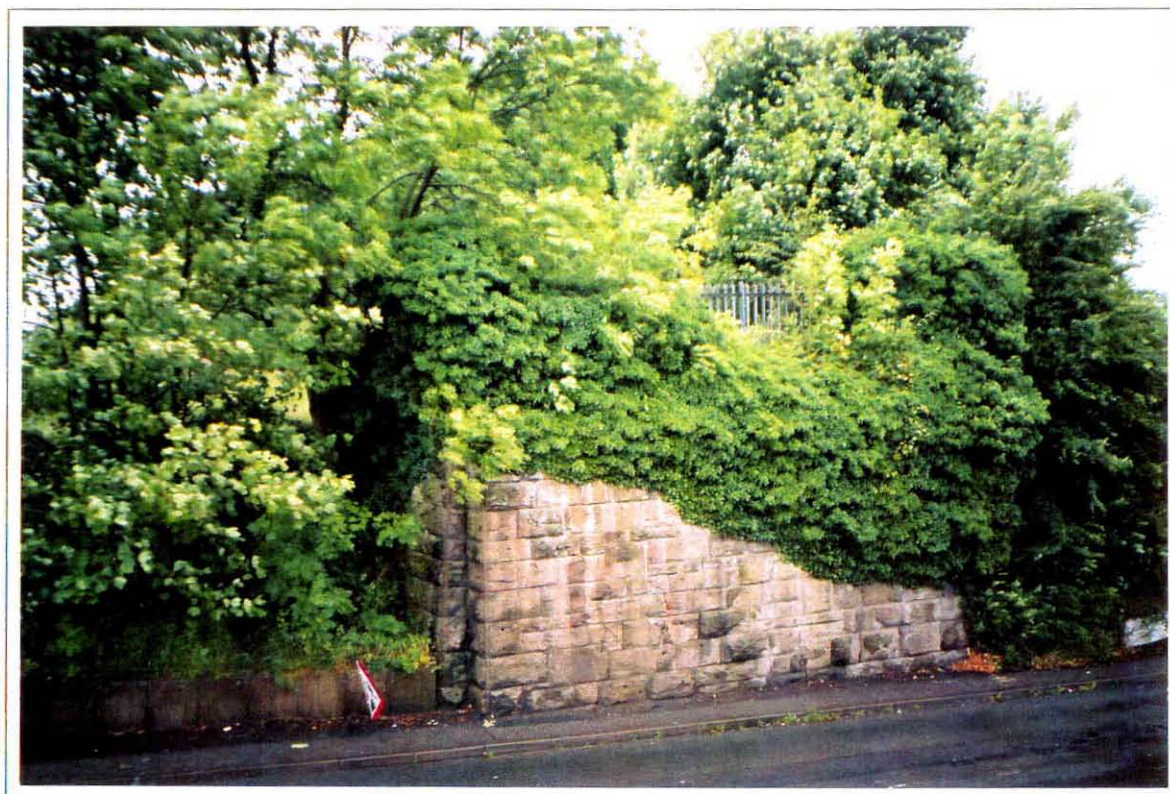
Railway bridge abutment. Photo CPAT 1096.03
